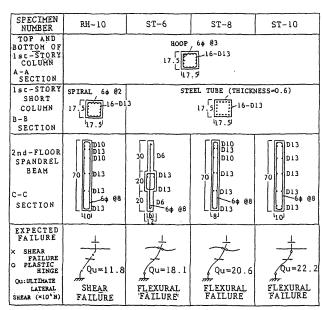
Detailing of Members and Expected Failure Modes of Subassemblages
